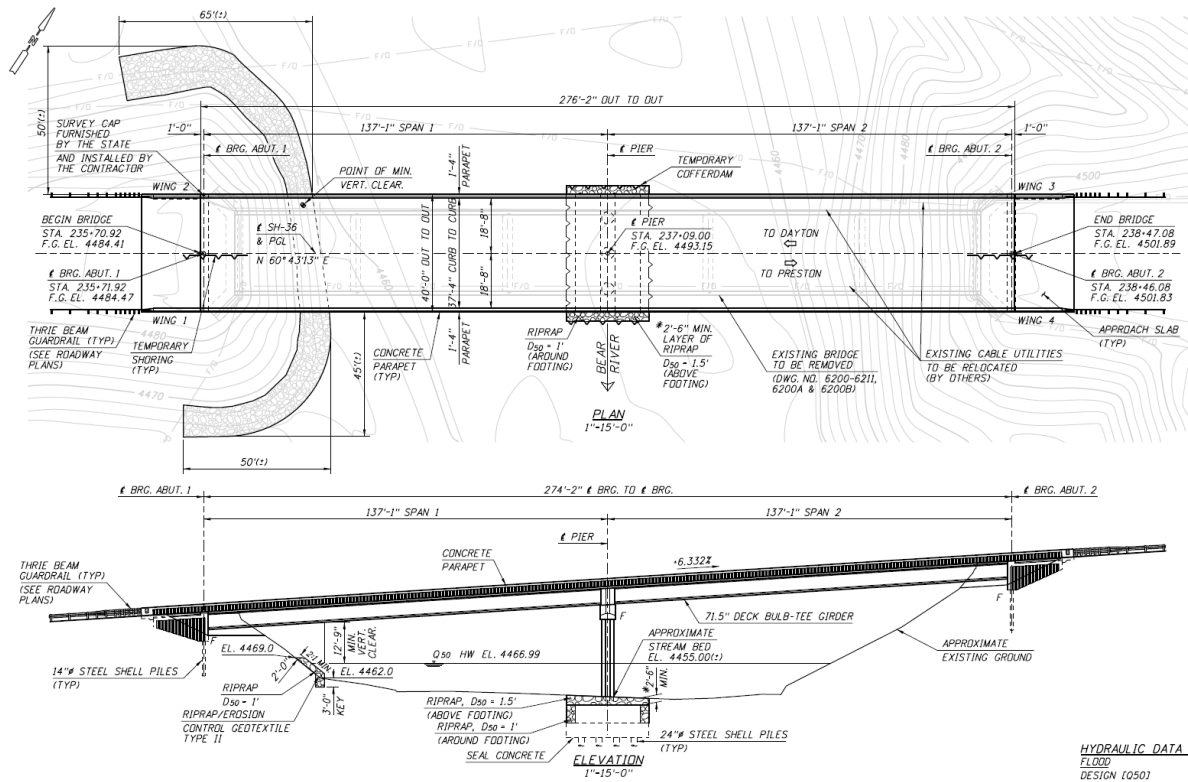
Elevation and Top View of SH-36 Bridge over Bear River
